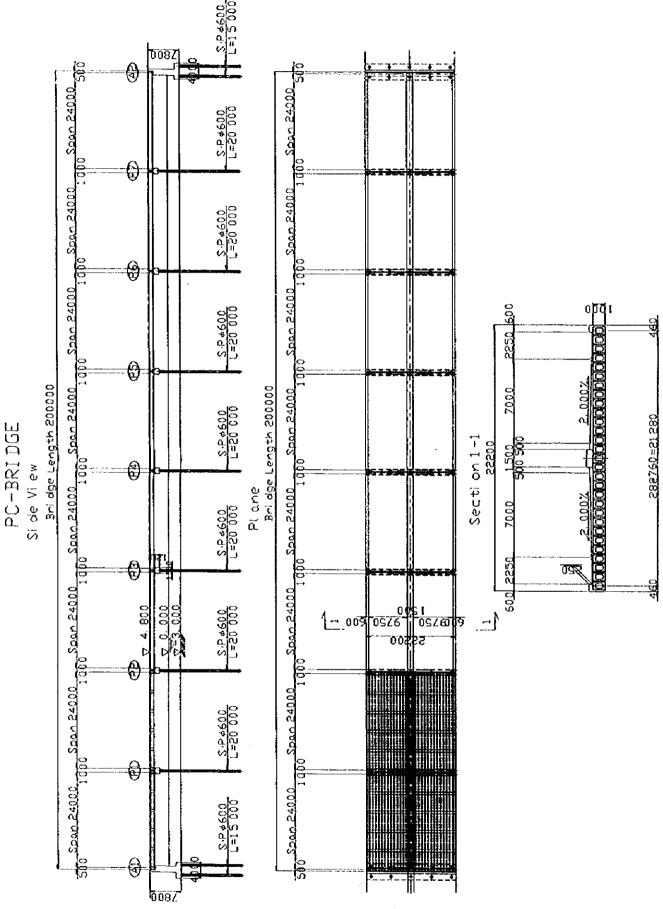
Typical Cross Section of Bridge (PC Girder)
